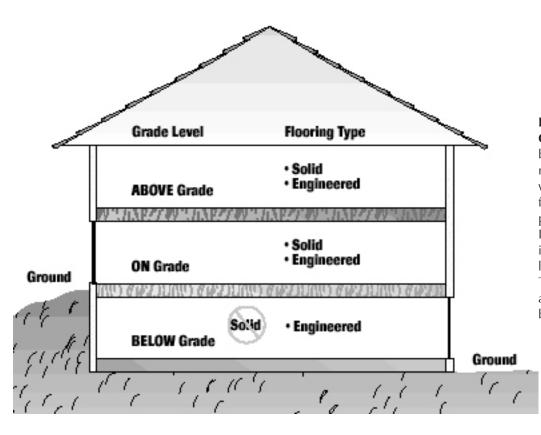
Grade Level Installation Guidelines – Engineered flooring can be installed above, on or below grade making is extremely versatile. Solid wood flooring is not recommended for installation below grade due to possible issues with moisture content. If soil surrounding a structure is 3 inches or more above the floor of any level, consider that level below grade. This includes walk-out basements. In addition, the surrounding soil should be slowed away from the structure.
